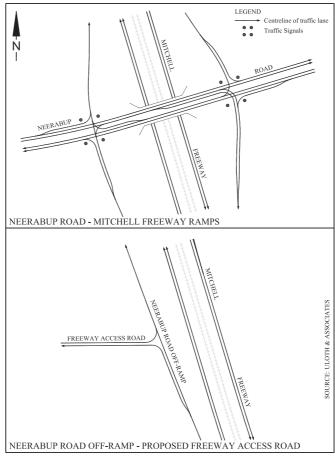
Recommended Intersection Configurations - Mitchell Freeway Ramps and Proposed Freeway Access Road
